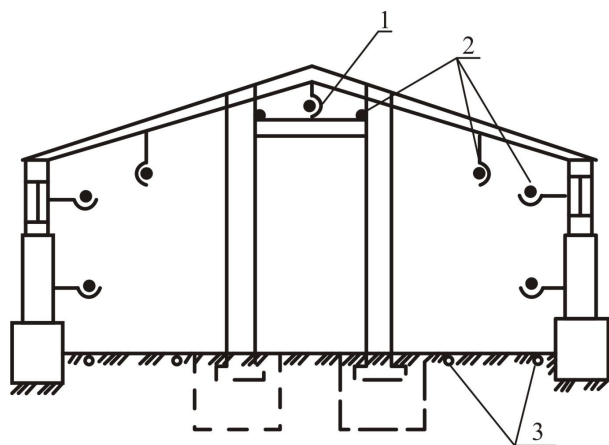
Soil glass-house with water heating: 1 – main inlet pipeline; 2 – pipes of space heating; 3 – pipes of under-soil heating
